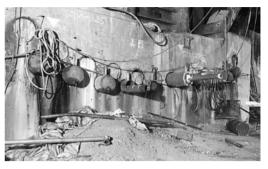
Horizontal umbrella placed between the new and existing tunnels (Wong et al 2008).
